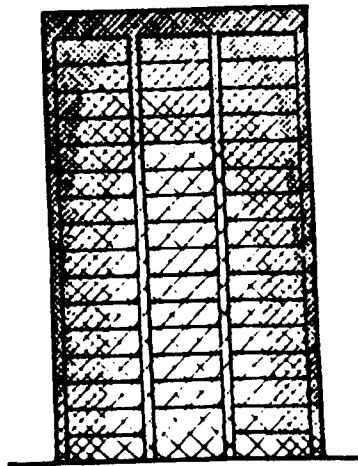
Typical wetting pattern on the face of a multi-storey building subjected to wind-driven rain.<sup>(125)</sup>
